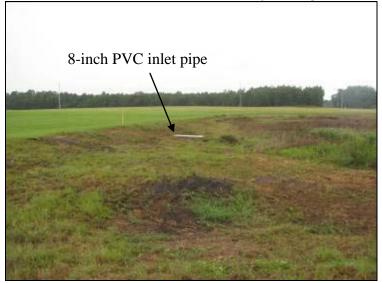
Ash Pond – Southeast embankment interior slope and pond surface area, looking south.
